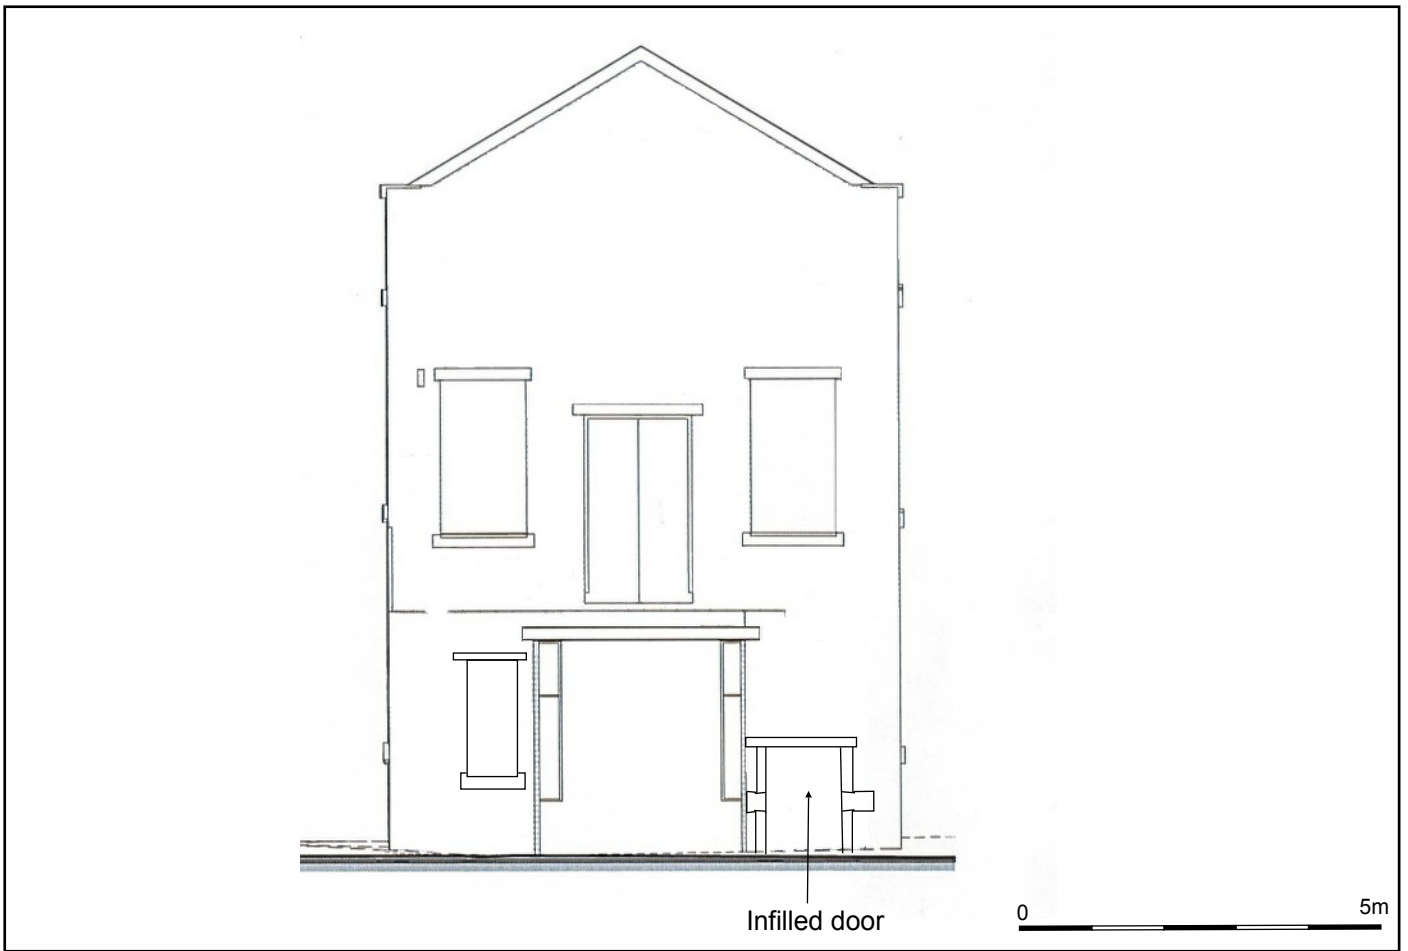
North elevation of the north wing, based on a drawing provided by the client.
